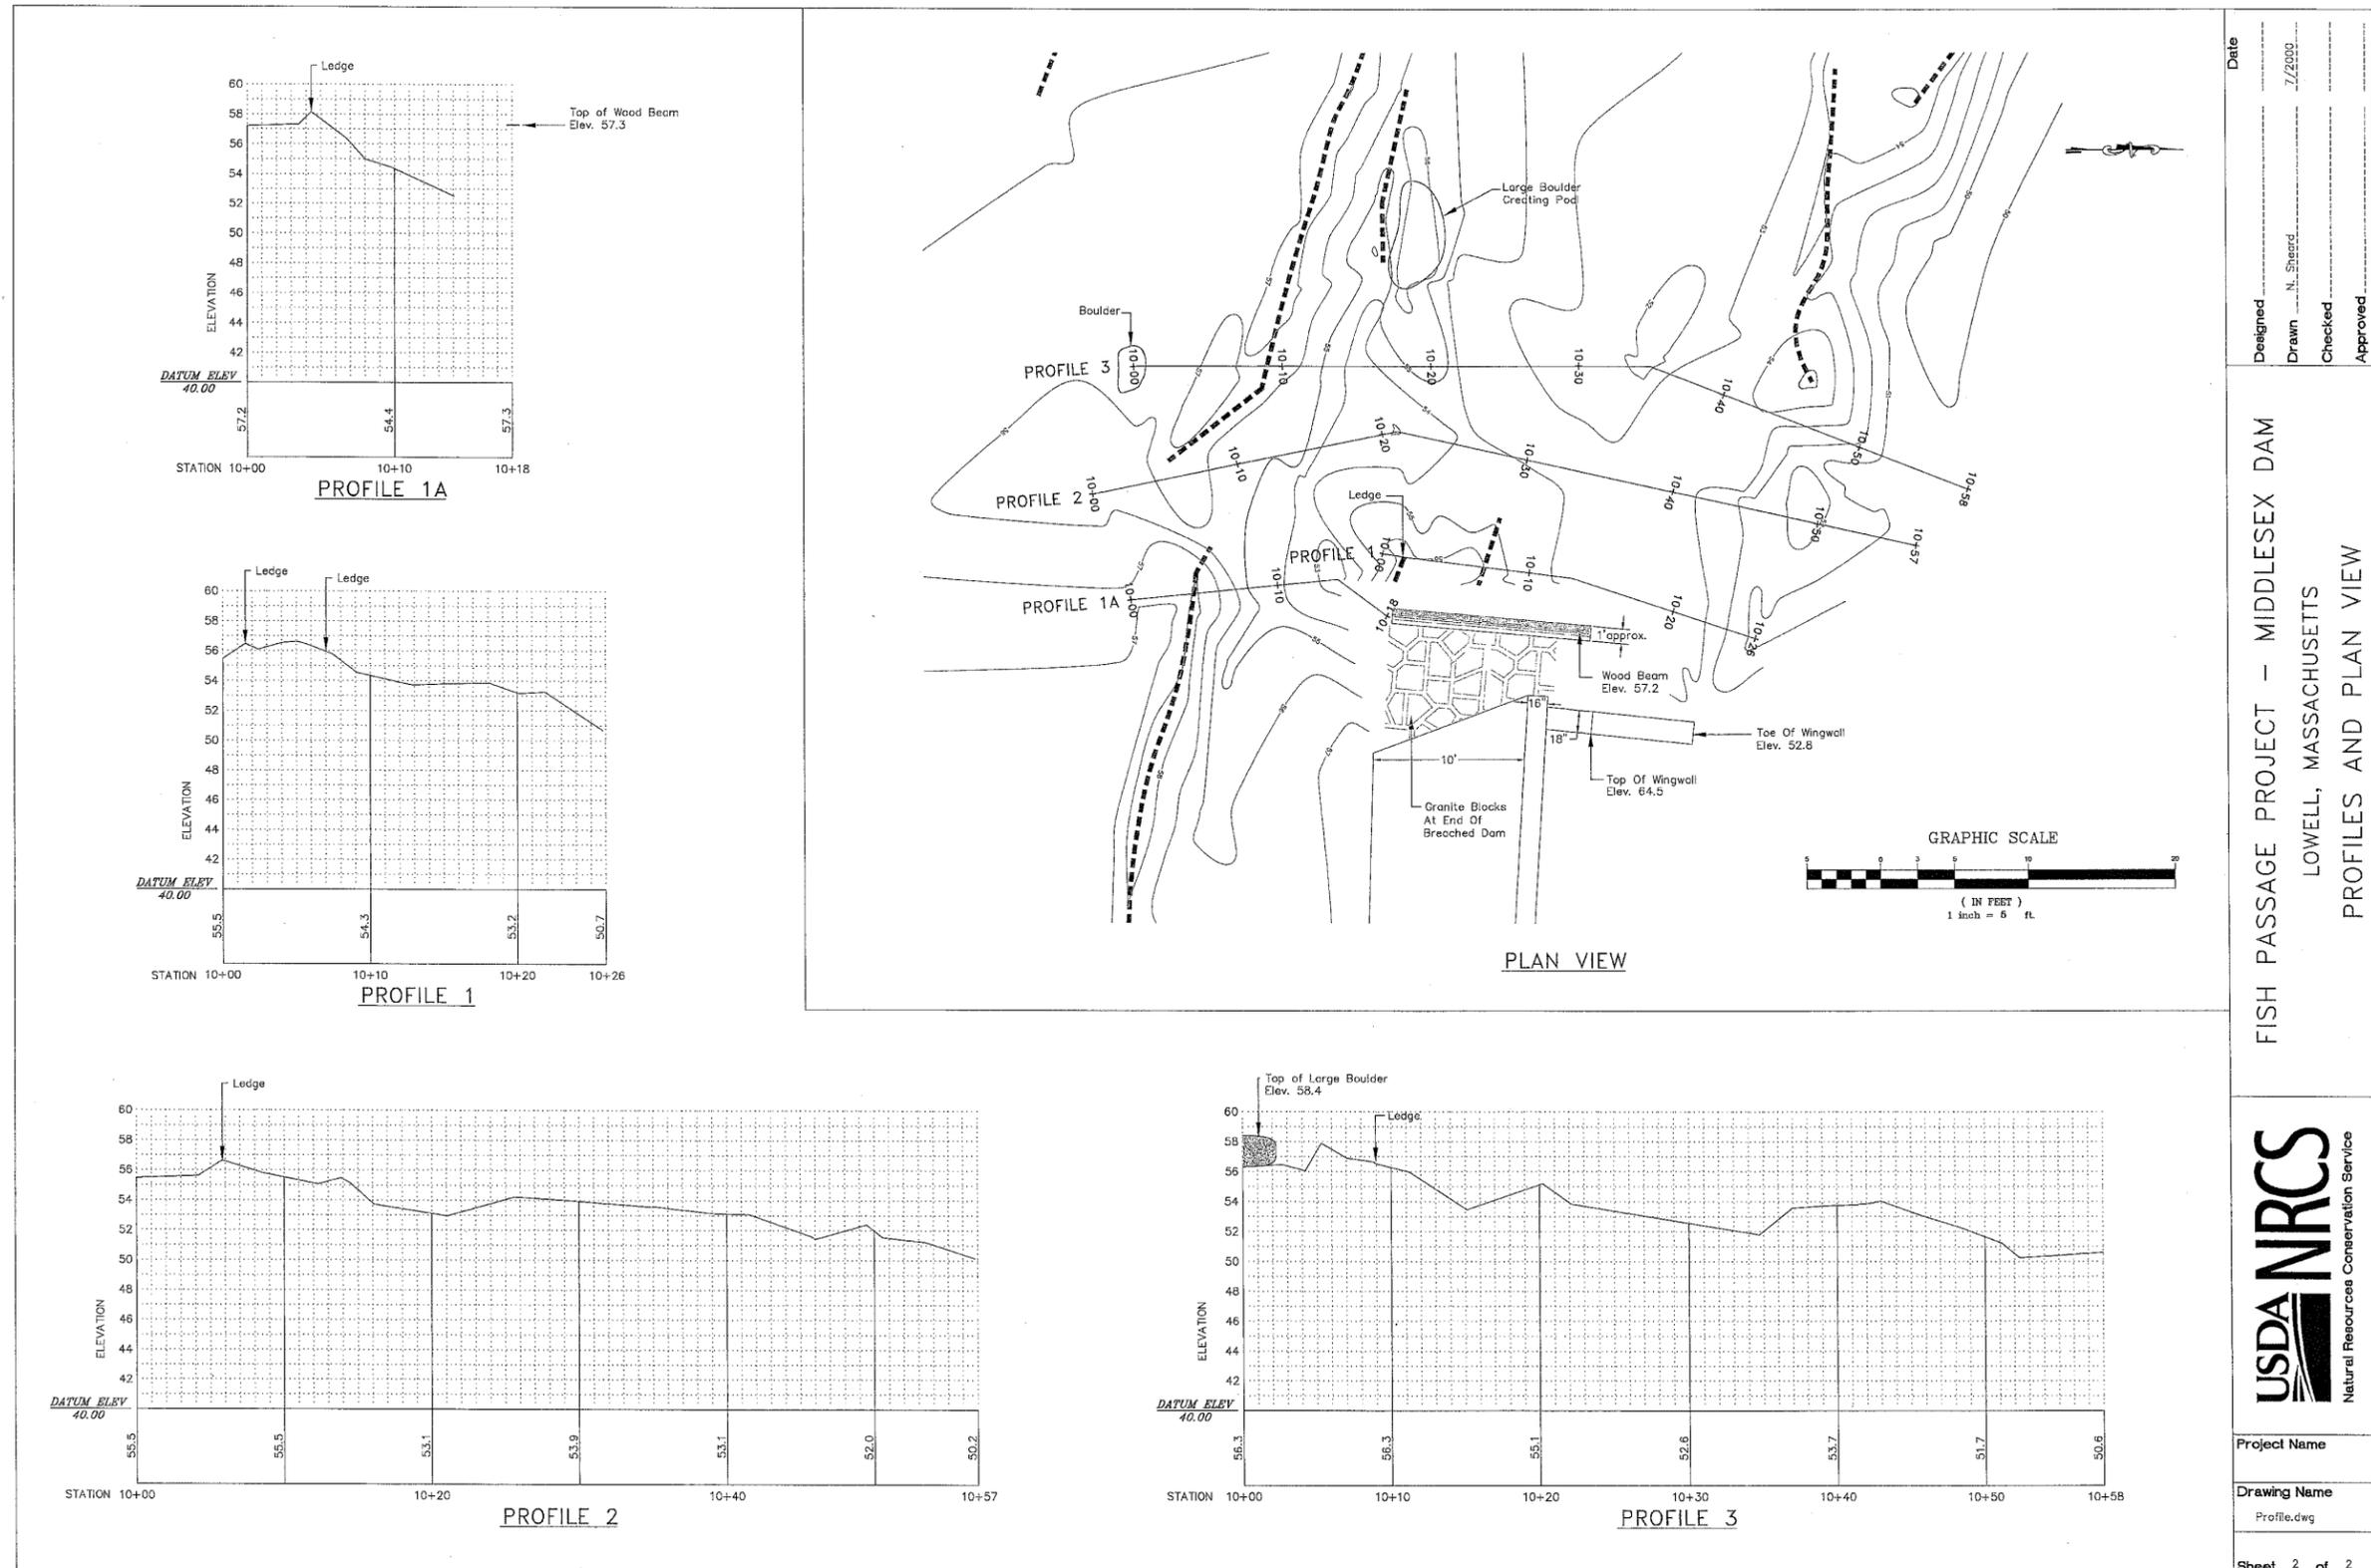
Middlesex Falls Existing Topographic Plan and Sections
